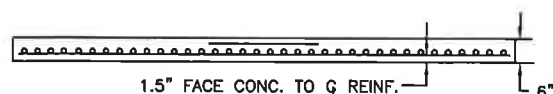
DETAIL OF TOP-REINFORCED CONCRETE SLAB FOR SMALL CATCH BASIN
